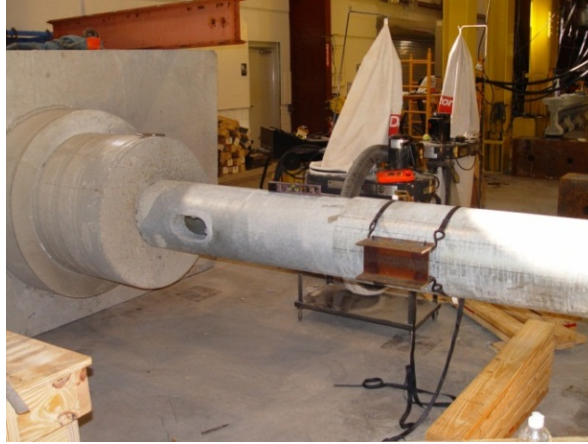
A short I-beam for supporting the drilling equipment for placement of bolt holes. Photo courtesy of FDOT.
